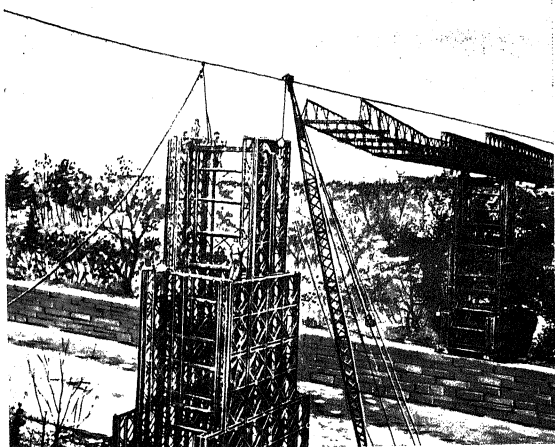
Erection of five-story panel crib pier using a highline and crane. These two five-story crib piers were built to support a 324-foot class 40 panel bridge.
